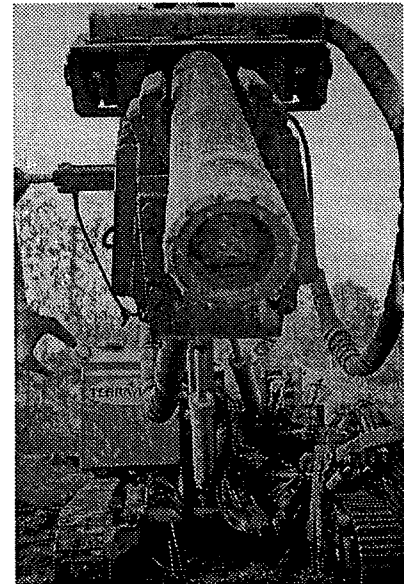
Testing of drill bits to penetrate old wooden piles.
